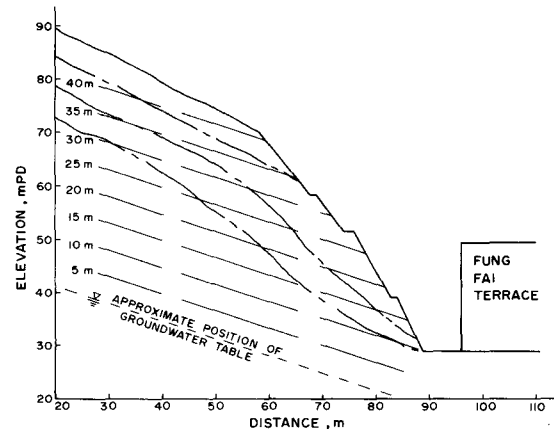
Soil Subdivision for Section A-A of Fung Fai Terrace
